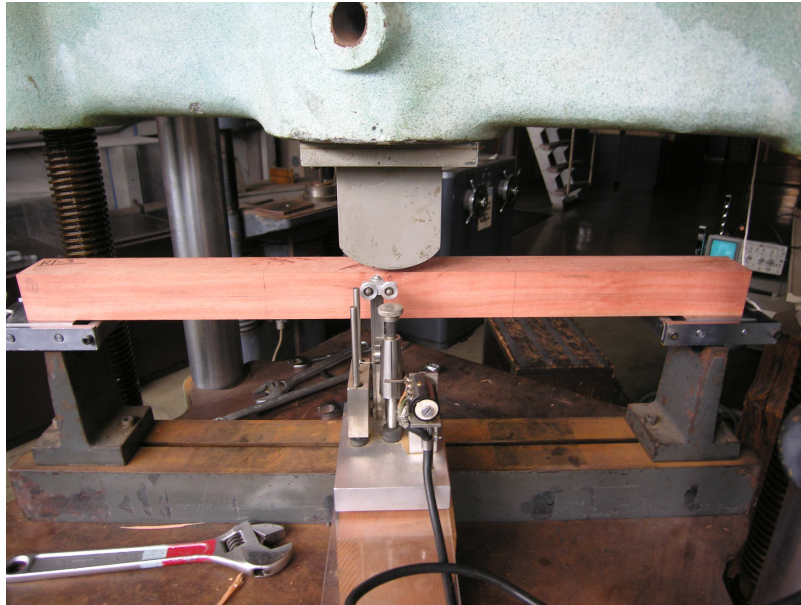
Test specimen placed in the bending test jig of the Baldwin Universal Testing Machine
